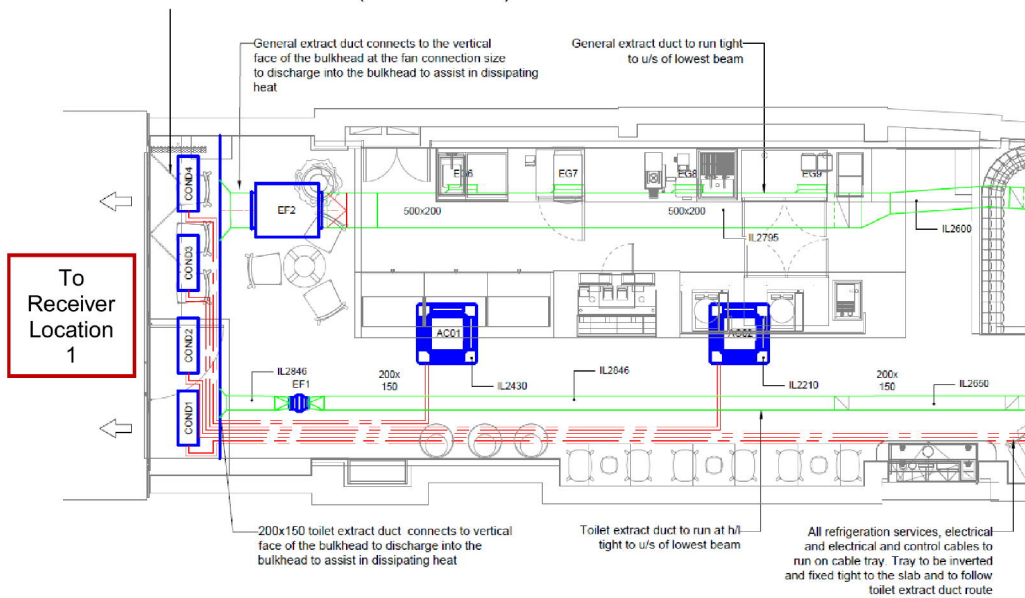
PROPOSED PLANT LAYOUT (NOT TO SCALE)
